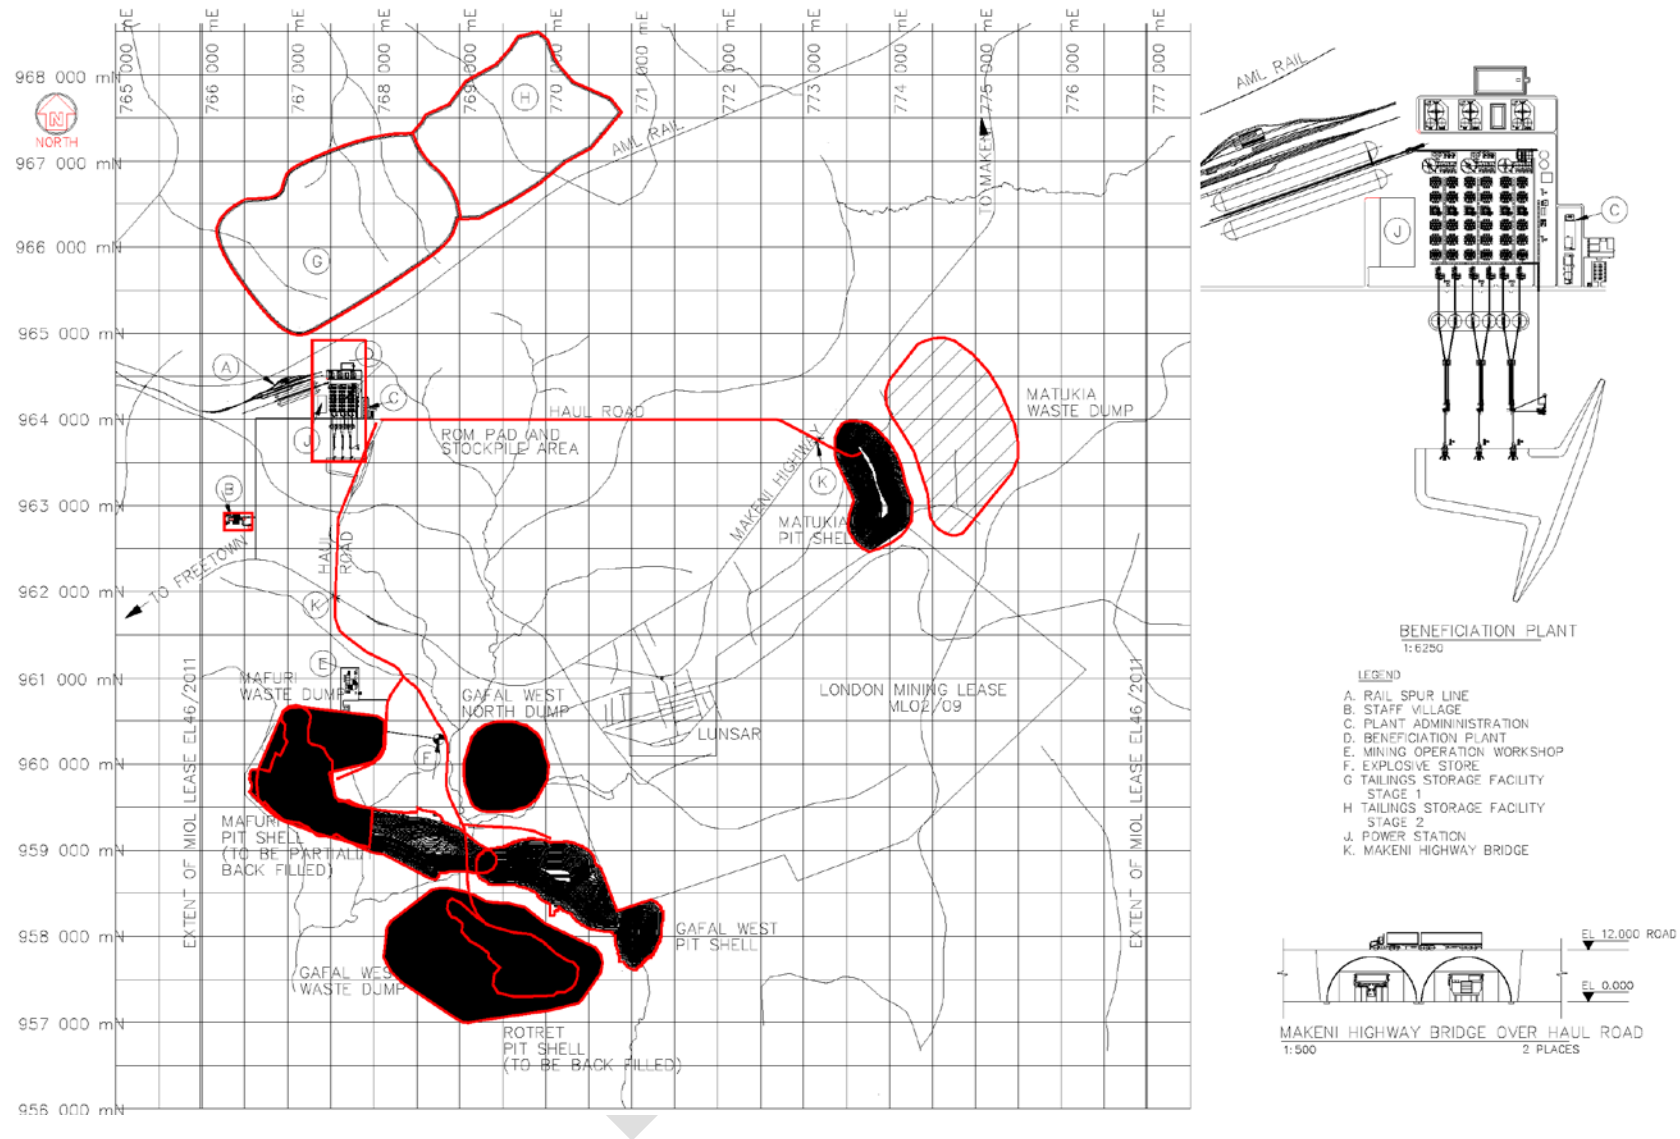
Overall site layout plan for the Project, with additional detail on the beneficiation plant and road crossing
